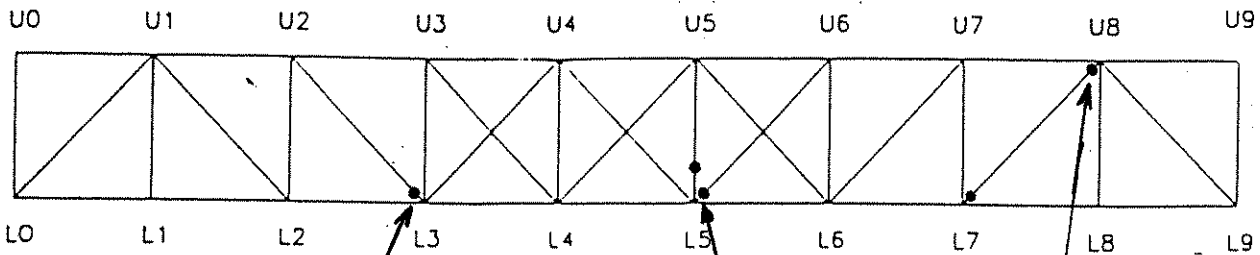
Span 7, Floorbeam 5, Gage Installations 86 - 89
